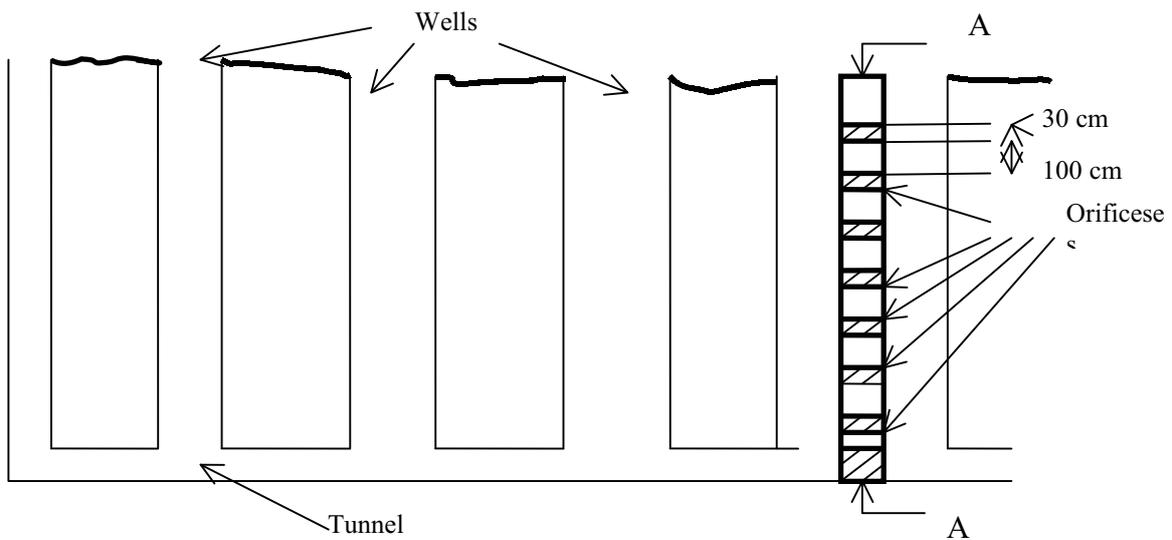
Structure of under ground dam built in Vazvan Qanat, Isfahan
